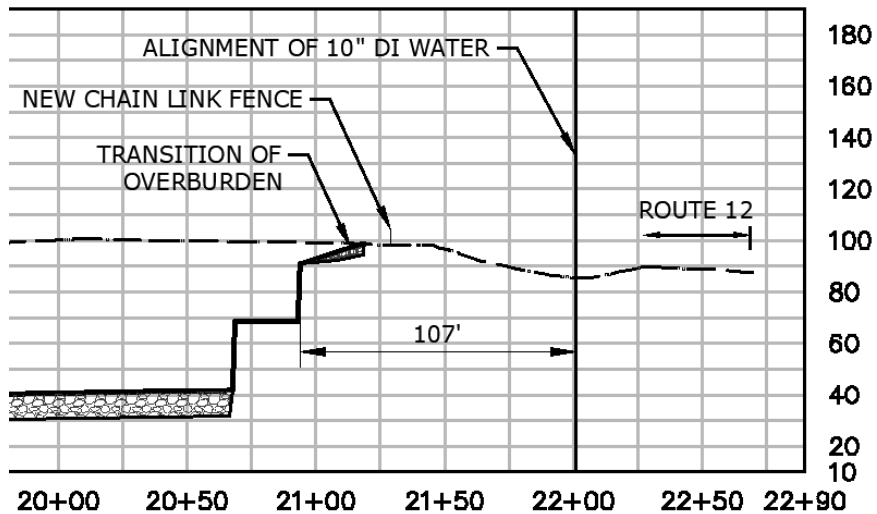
Cross-section view looking north of the typical planned perimeter rock cut at the closest distance to the WCPA water line showing the 20-foot upper bench face from elevation 70 to 90 and lower bench 30-foot face from elevation 40 to 70; upper bench crest is 107 ft from the WCPA water line along the western edge of CT 12.
